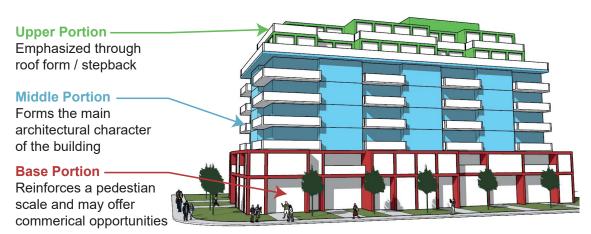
Built Form Characteristics of Mid-Rise Buildings
